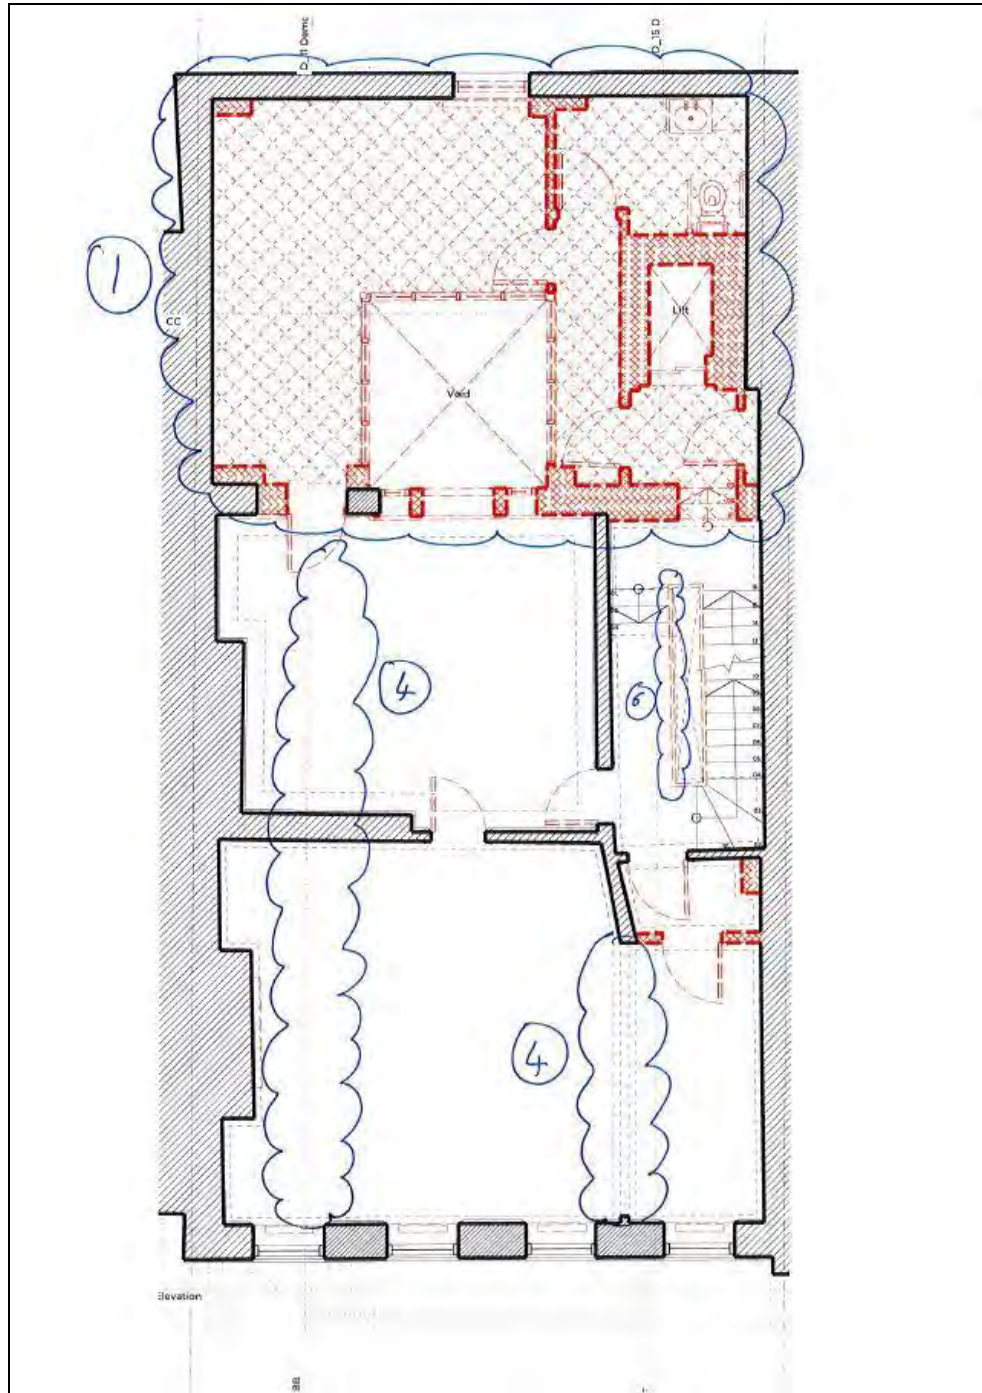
Existing First Floor Layout (demolition shown hatched red)
